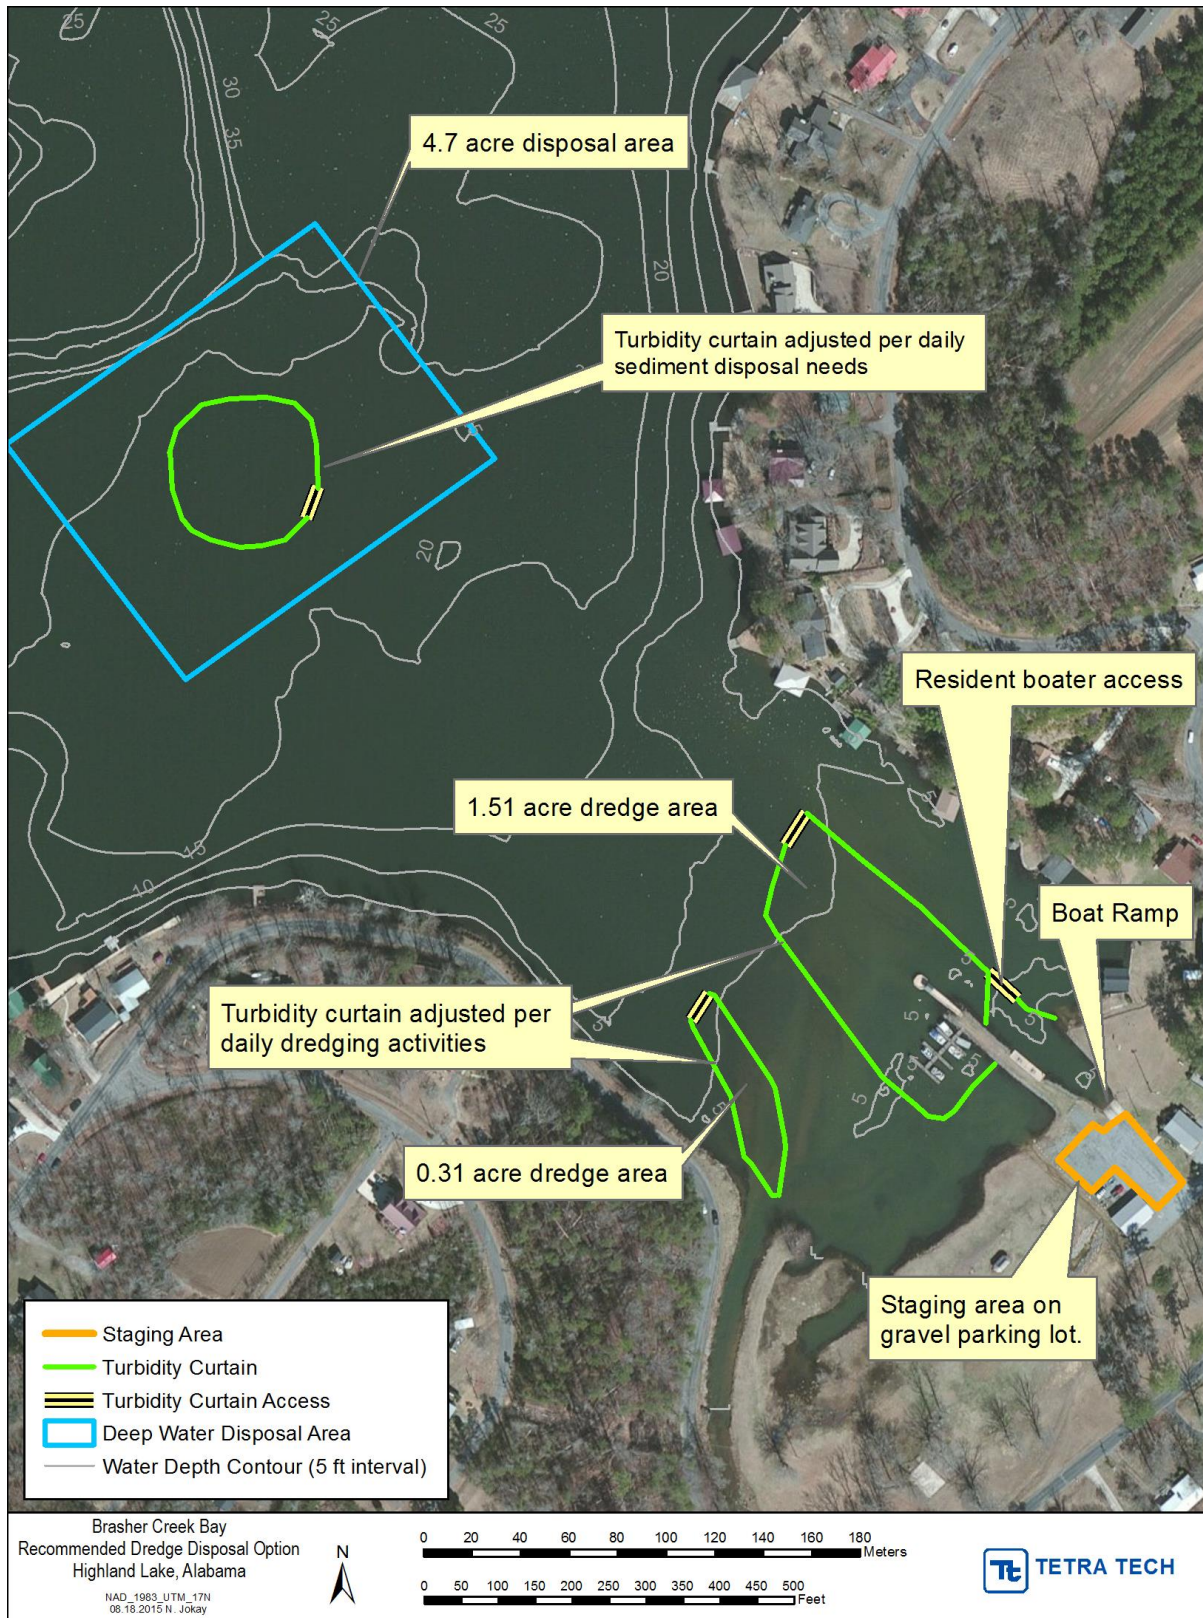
Recommended dredging and disposal plan- Brasher Creek Bay detail
